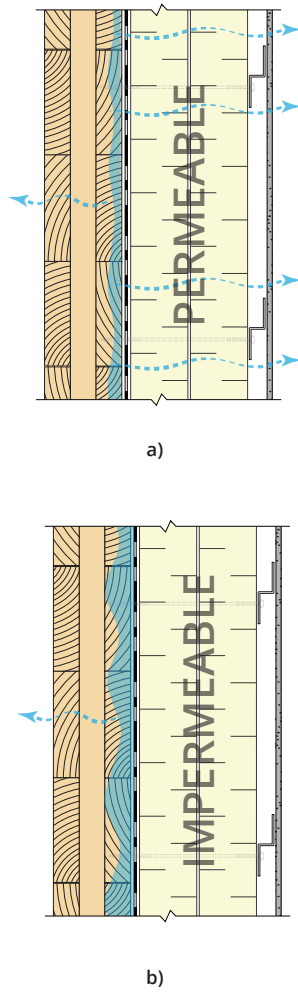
Example wall assembly (plan view) showing the relative rate of drying toward the building exterior: a) vapor-permeable exterior insulation and a vapor-permeable air barrier and WRB membrane; b) vapor-impermeable exterior insulation or impermeable air barrier and WRB membrane. While the interior laminations of the CLT can dry out relatively quickly, the outer lamination behind the impermeable membrane and insulation will take months or years to fully dry out. Although shown on a wall assembly in this figure, the need for vapor-permeable layers to support assembly drying also applies to floor/soffit assemblies.
